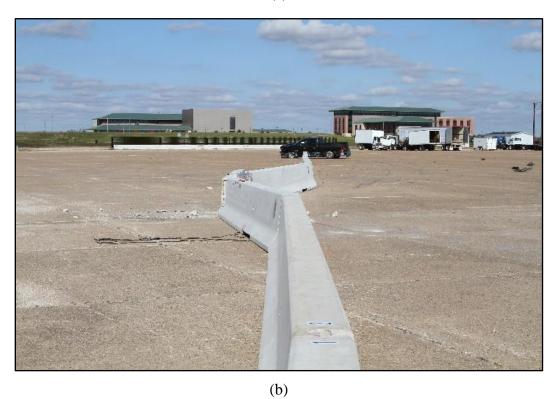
Damaged Portable Concrete Barriers after Test No. 440592-1.
